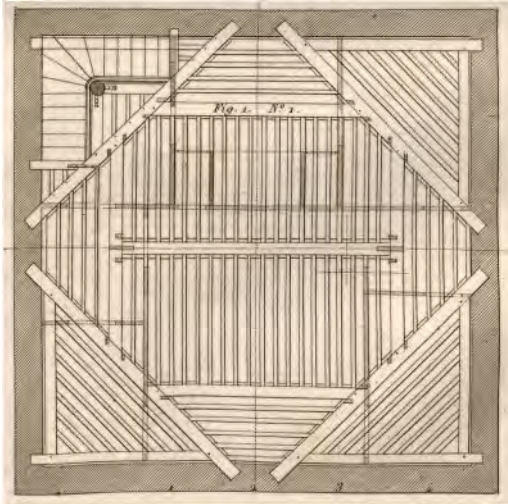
Drawing of a floor with short beams (Krafft 1805).
